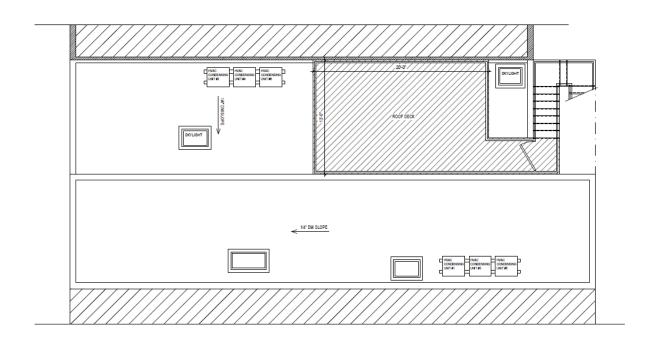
46-48 S. Carrollton Avenue – Proposed rooftop plan
